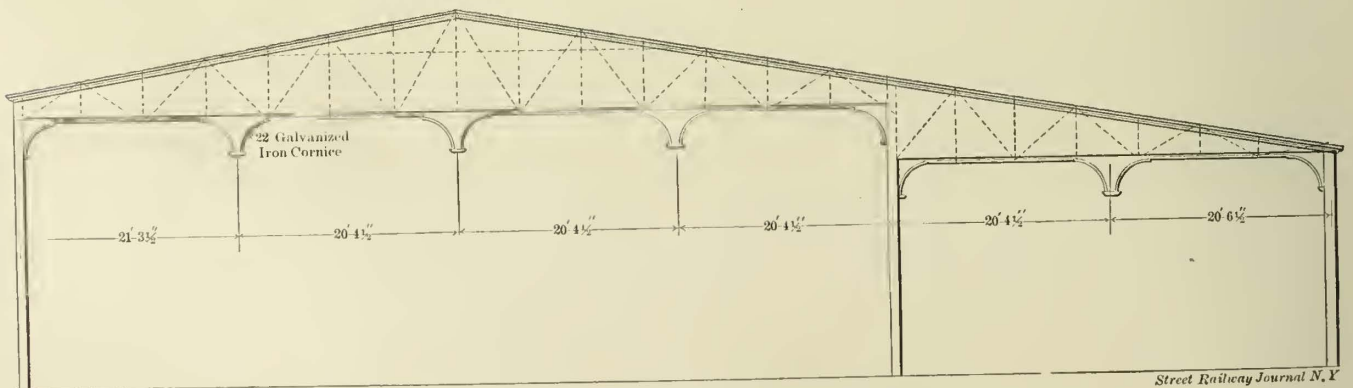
ELEVATION OF NEW CAR HOUSE—LINDELL RAILWAY CO, ST. LOUIS.
